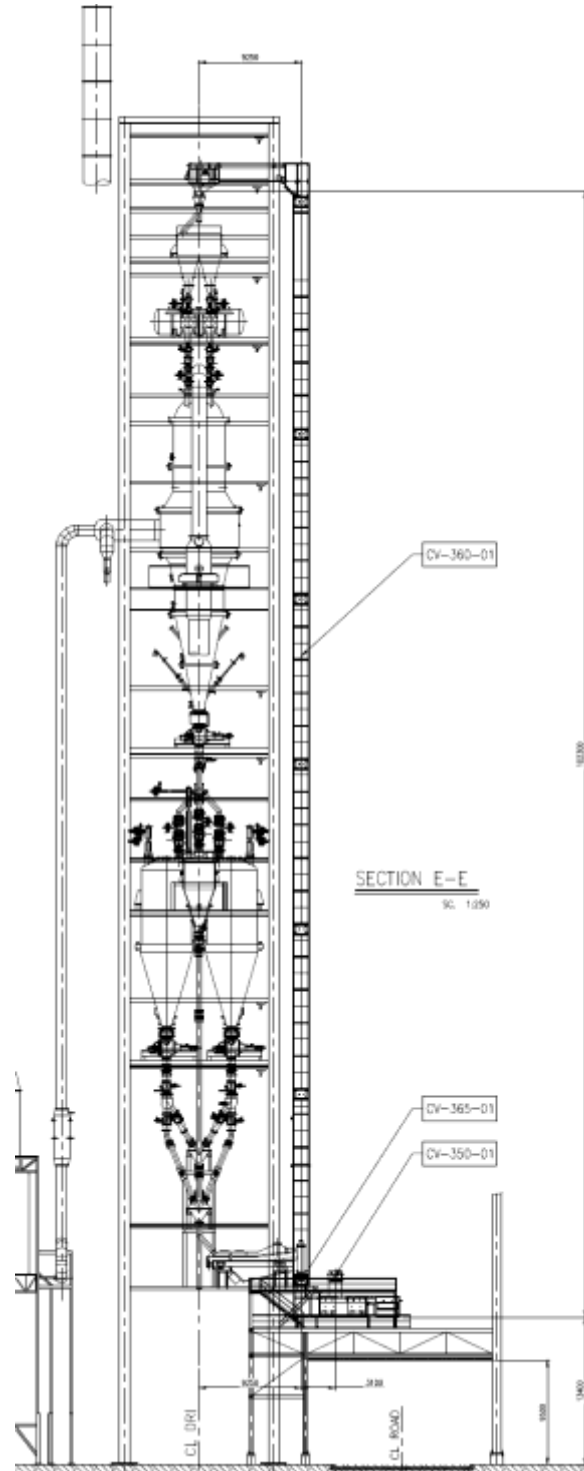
elevation view of the elevating conveyor attached to the reactor tower
